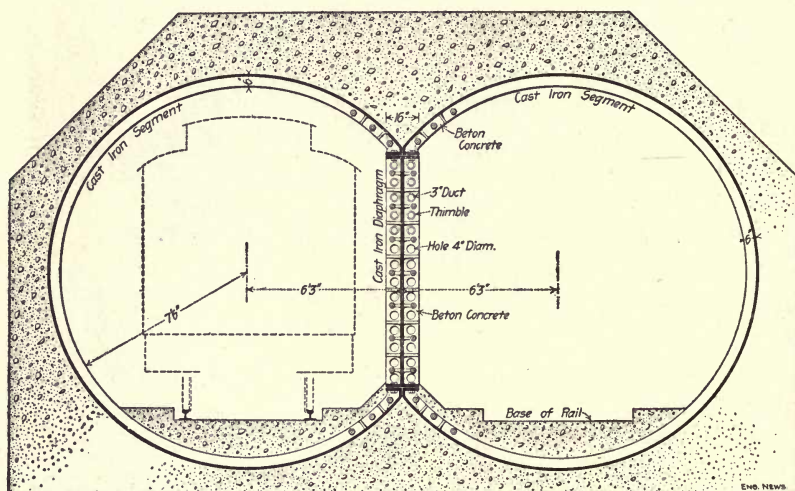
Twin-tube Tunnel Under Harlem River.
